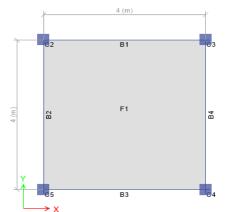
Single Storey Building Symmetric in Plan with Column Modelled as they are
